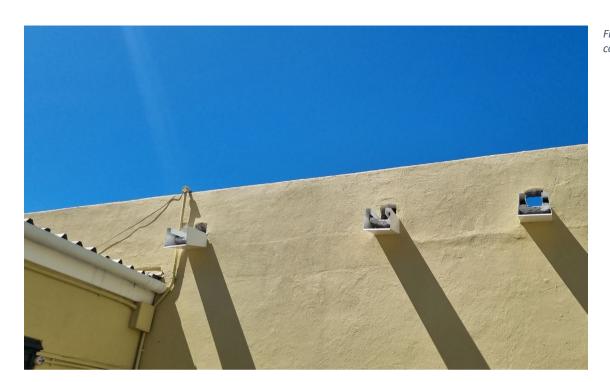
Image shows the water outlets to roof in clean and good condition. Discuss the option of hopper boxes and downpipes.
